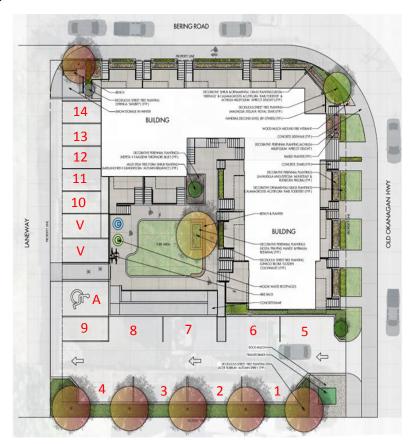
14 parking spaces provided for the 14 townhouse units, 1 accessible parking space, and 2 visitor parking spaces.
